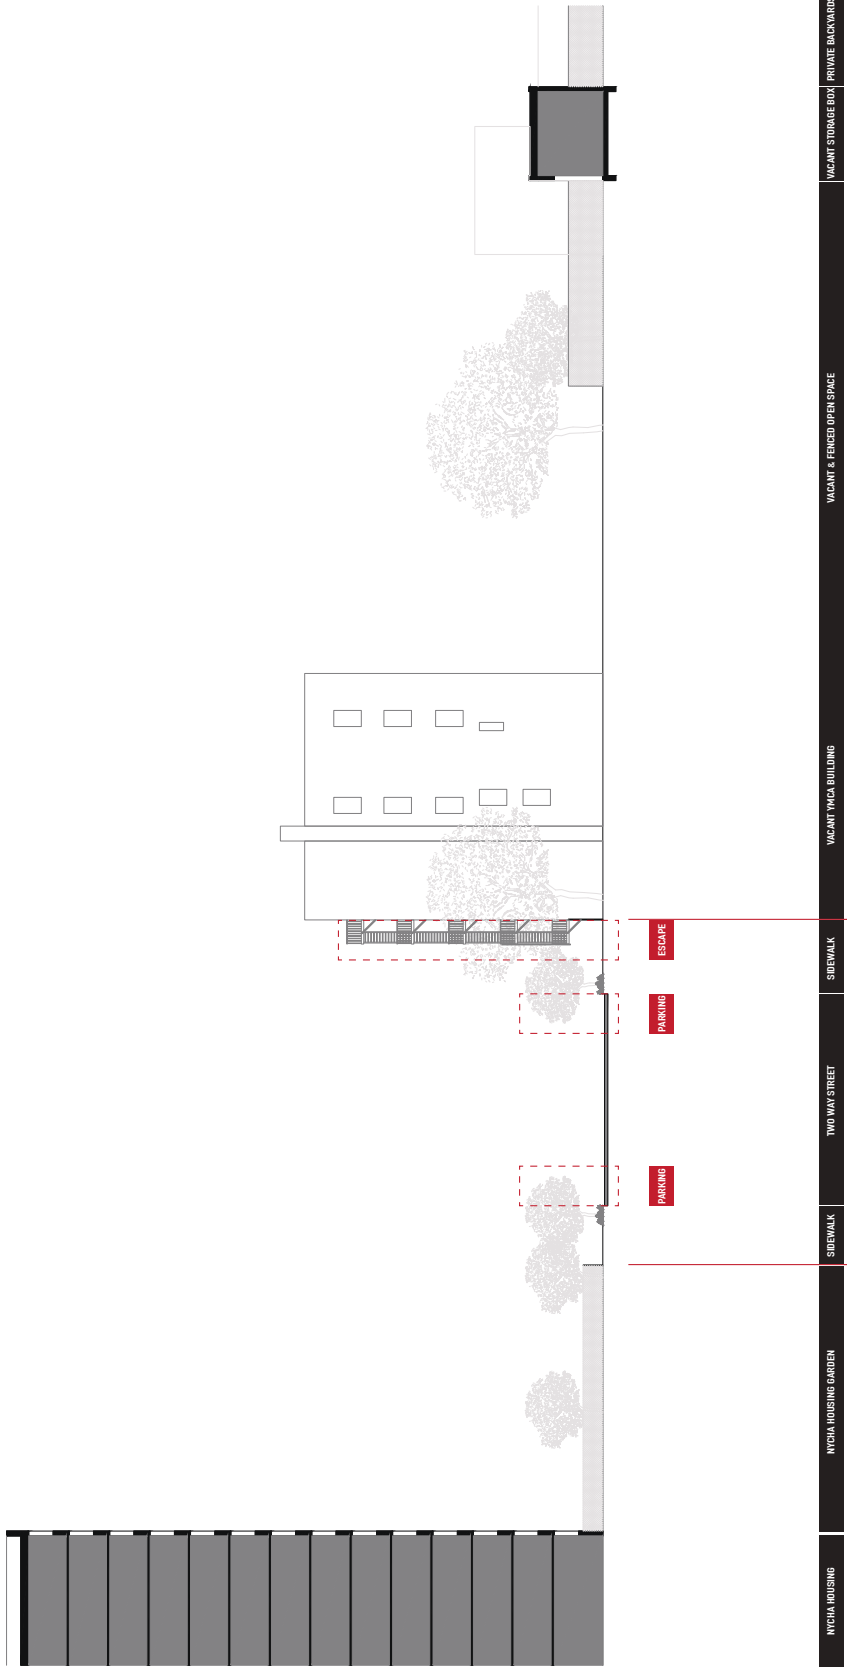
STREETSCAPE ACTIVITIES AT SITE 2 (YMCA-SITE, RICHARDS STREET CENTRAL) : EAST-WEST SECTION
